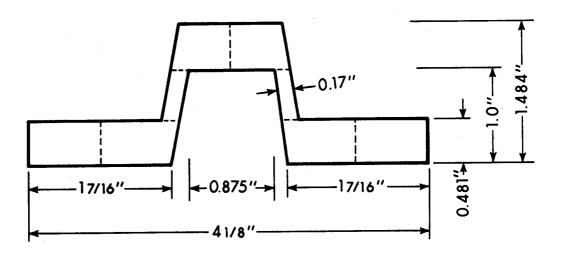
SECTION L - DIMENSIONS TAKEN FROM MANUFACTURERS CATALOGUE
